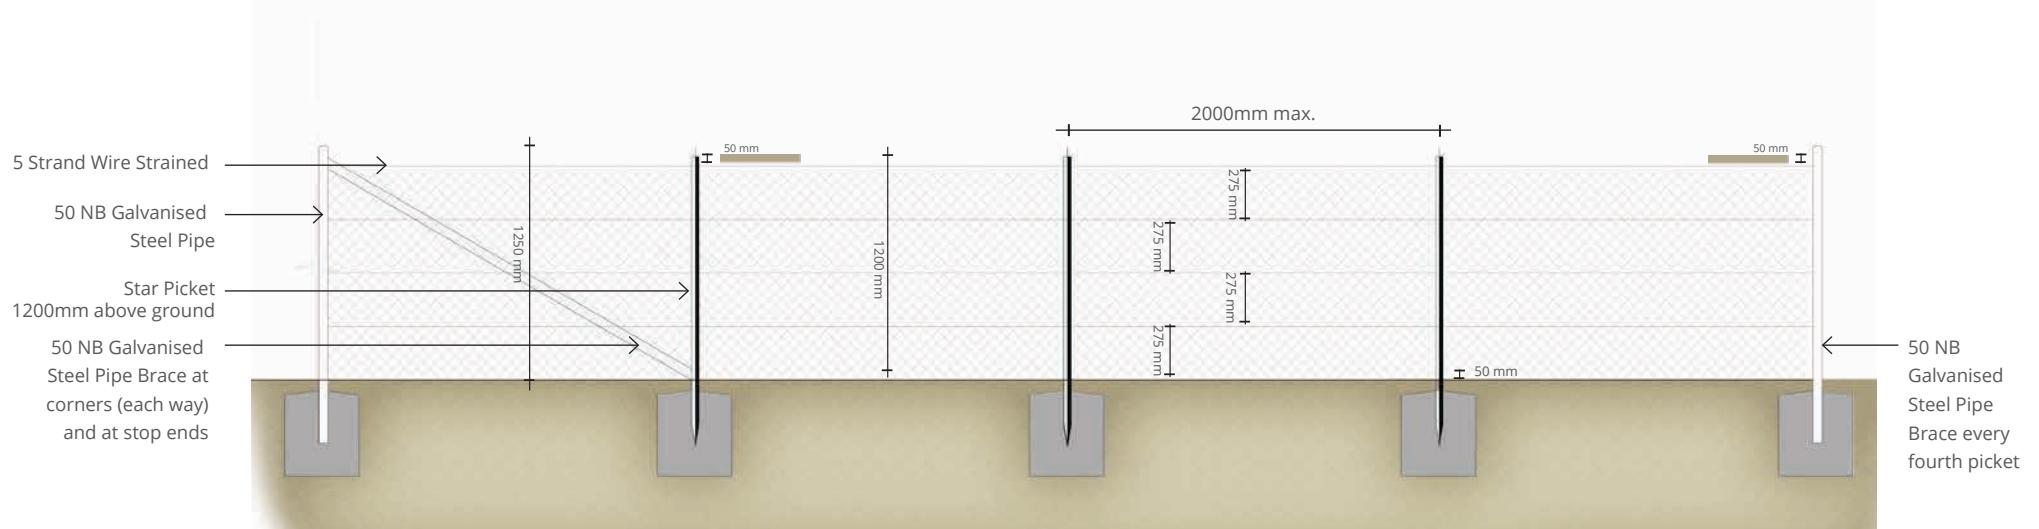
Typical Section- Star Picket Fence with 5 Strand Wire. Recommended
